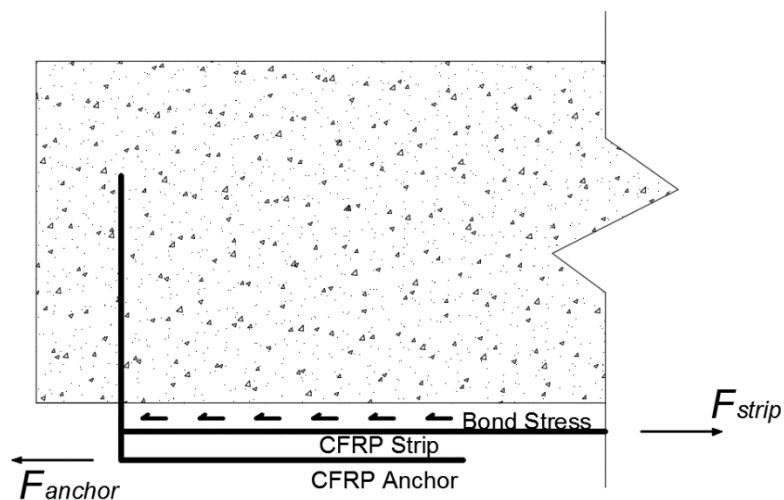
Load transferring from CFRP strip to CFRP anchor
